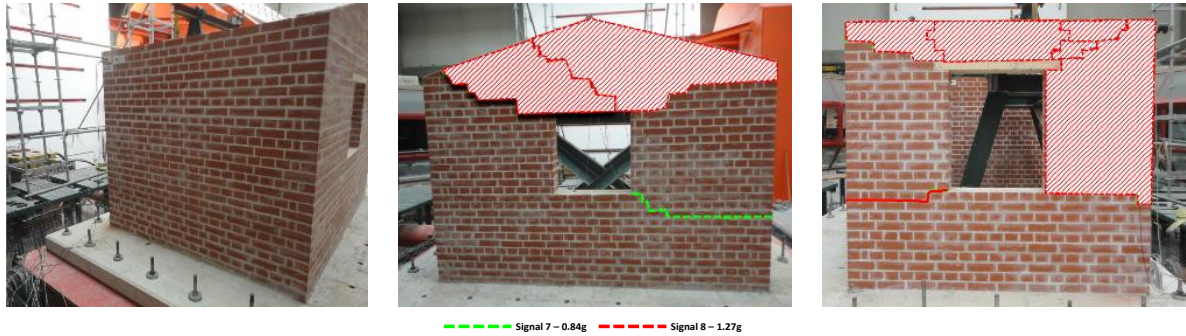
Failure mechanism from the shaking table tests for the brick masonry specimen
